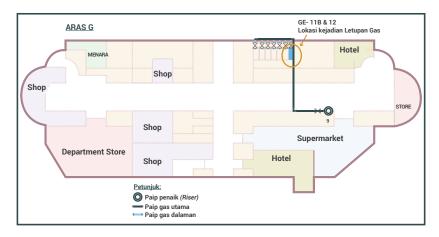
Gas Piping Layout for Food and Beverage Outlet Restaurant
